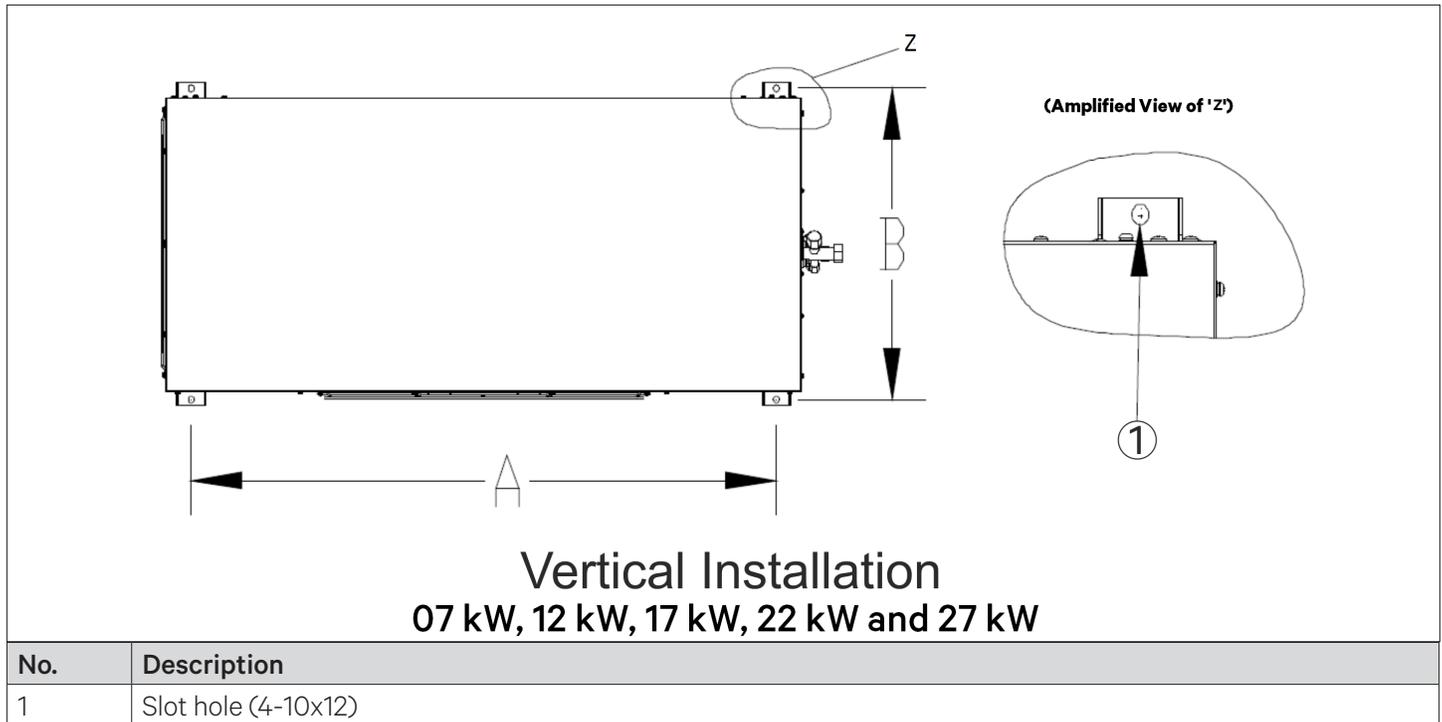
Hole Dimension of Outdoor Unit Base (Vertical Installation)
